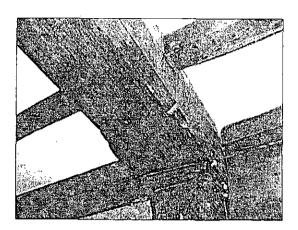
Room 2, kitchen. Axial ceiling beam with flat chamfer and lambs tongue stop (eighteenth century)
